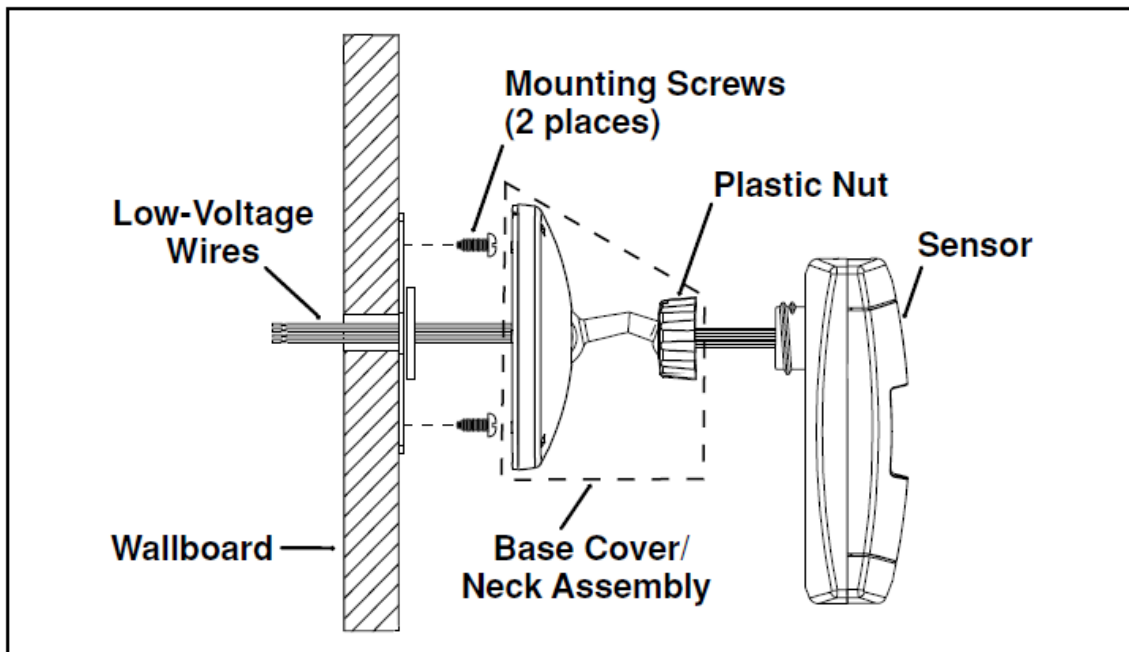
MC-W WALL MOUNT INSTALLATION
